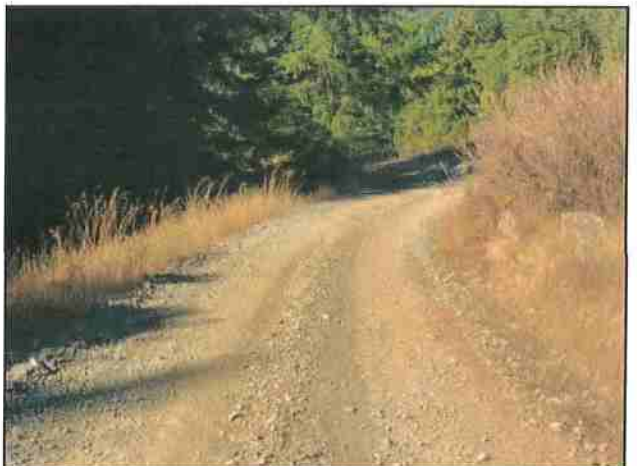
Private Access Rd @ Curve w/ Turn-out Looking NW
